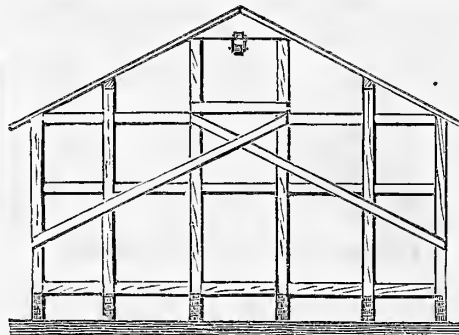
CROSS SECTION OF STORE HOUSE.
